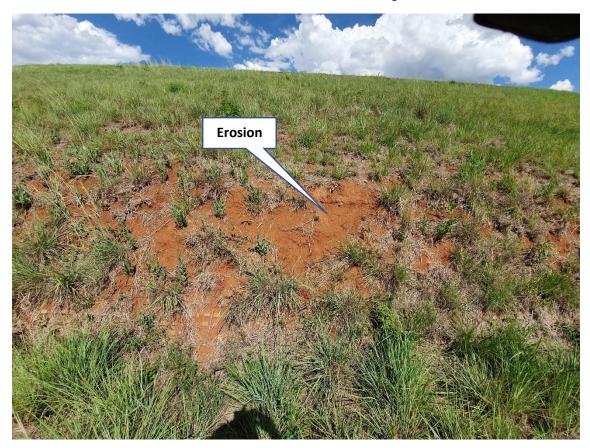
Downstream face erosion on steeper slope section typically above berm drain (19 November 2019). Note reddish clayey sand embankment material exposed.
